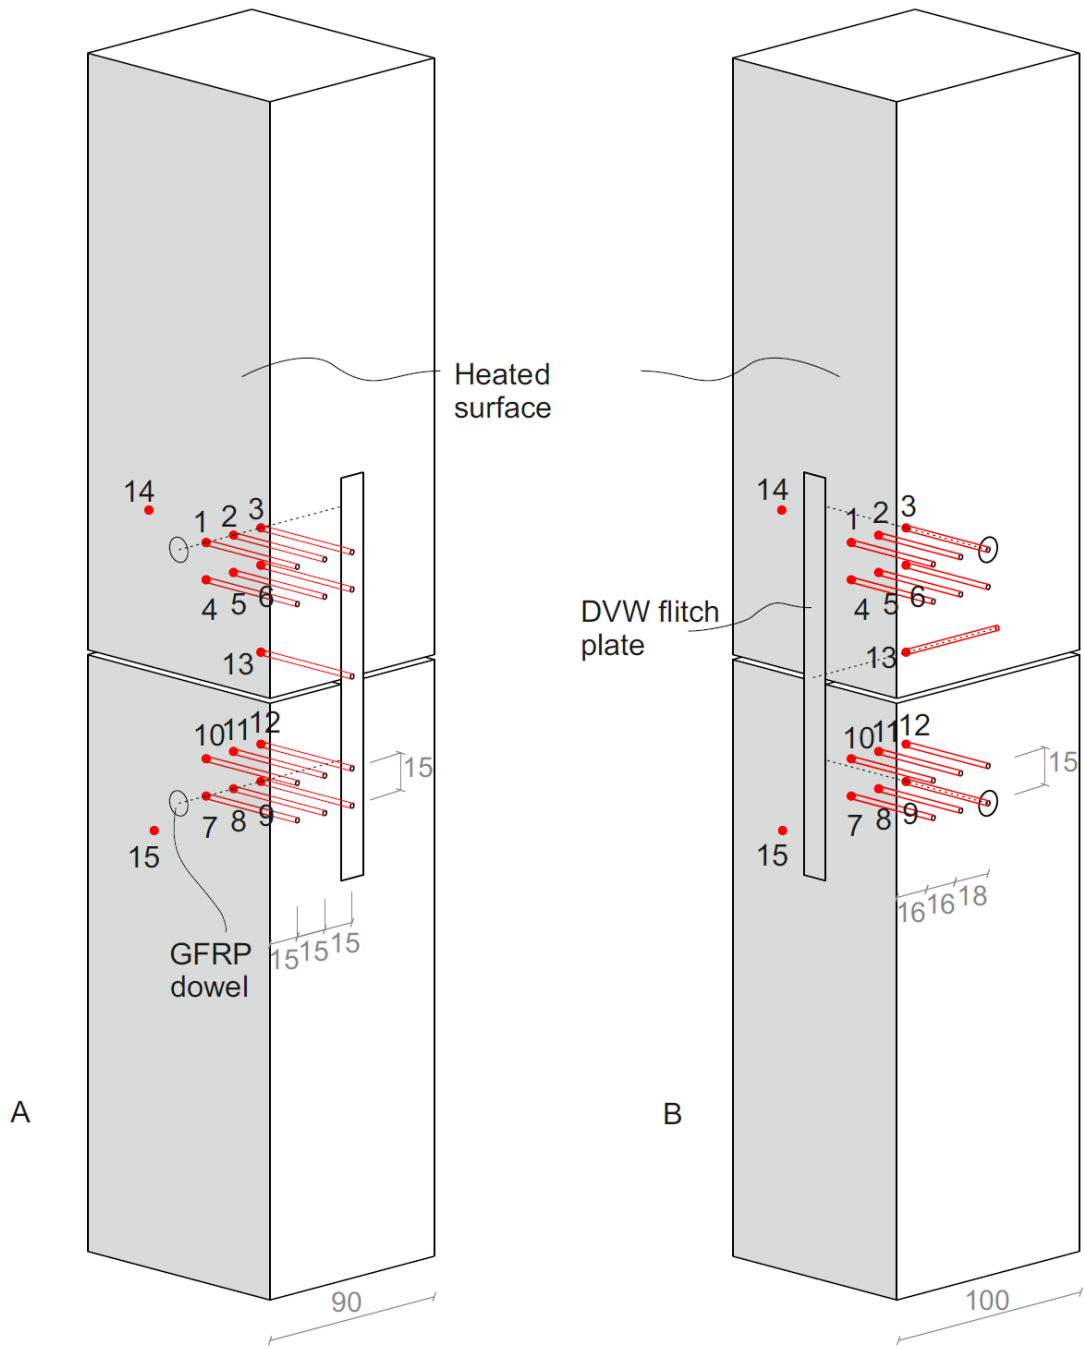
Locations of thermocouples in H-TRIS tests (dimensions in mm)
